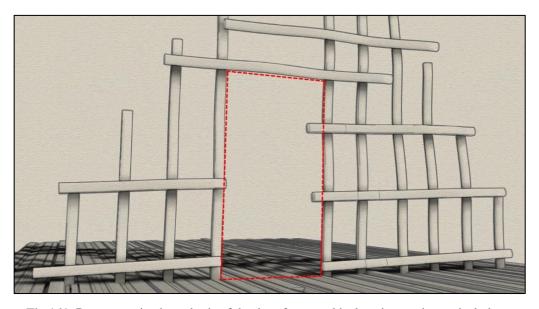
Reconstructive hypothesis of the door frame and its location on the vertical plane (model by the author).
